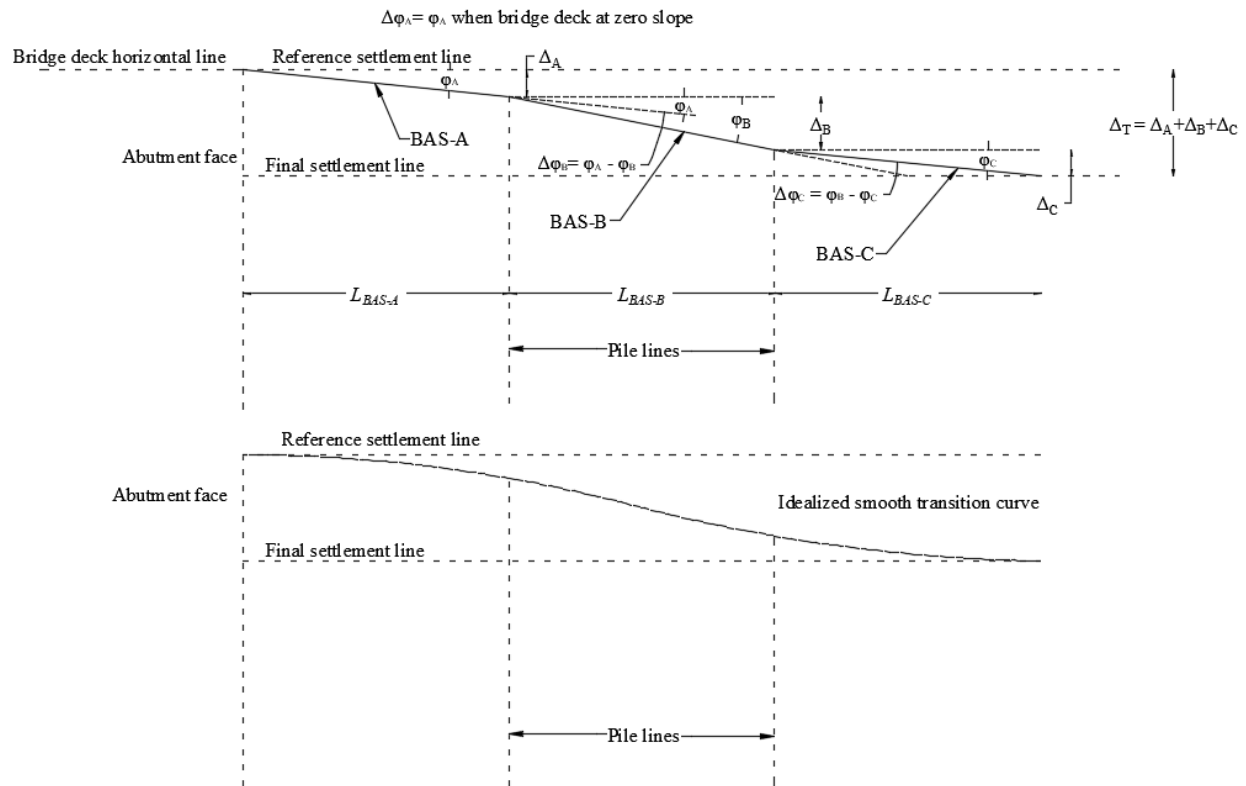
Schematic of the proposed multi-segment pile-supported approach slab system
